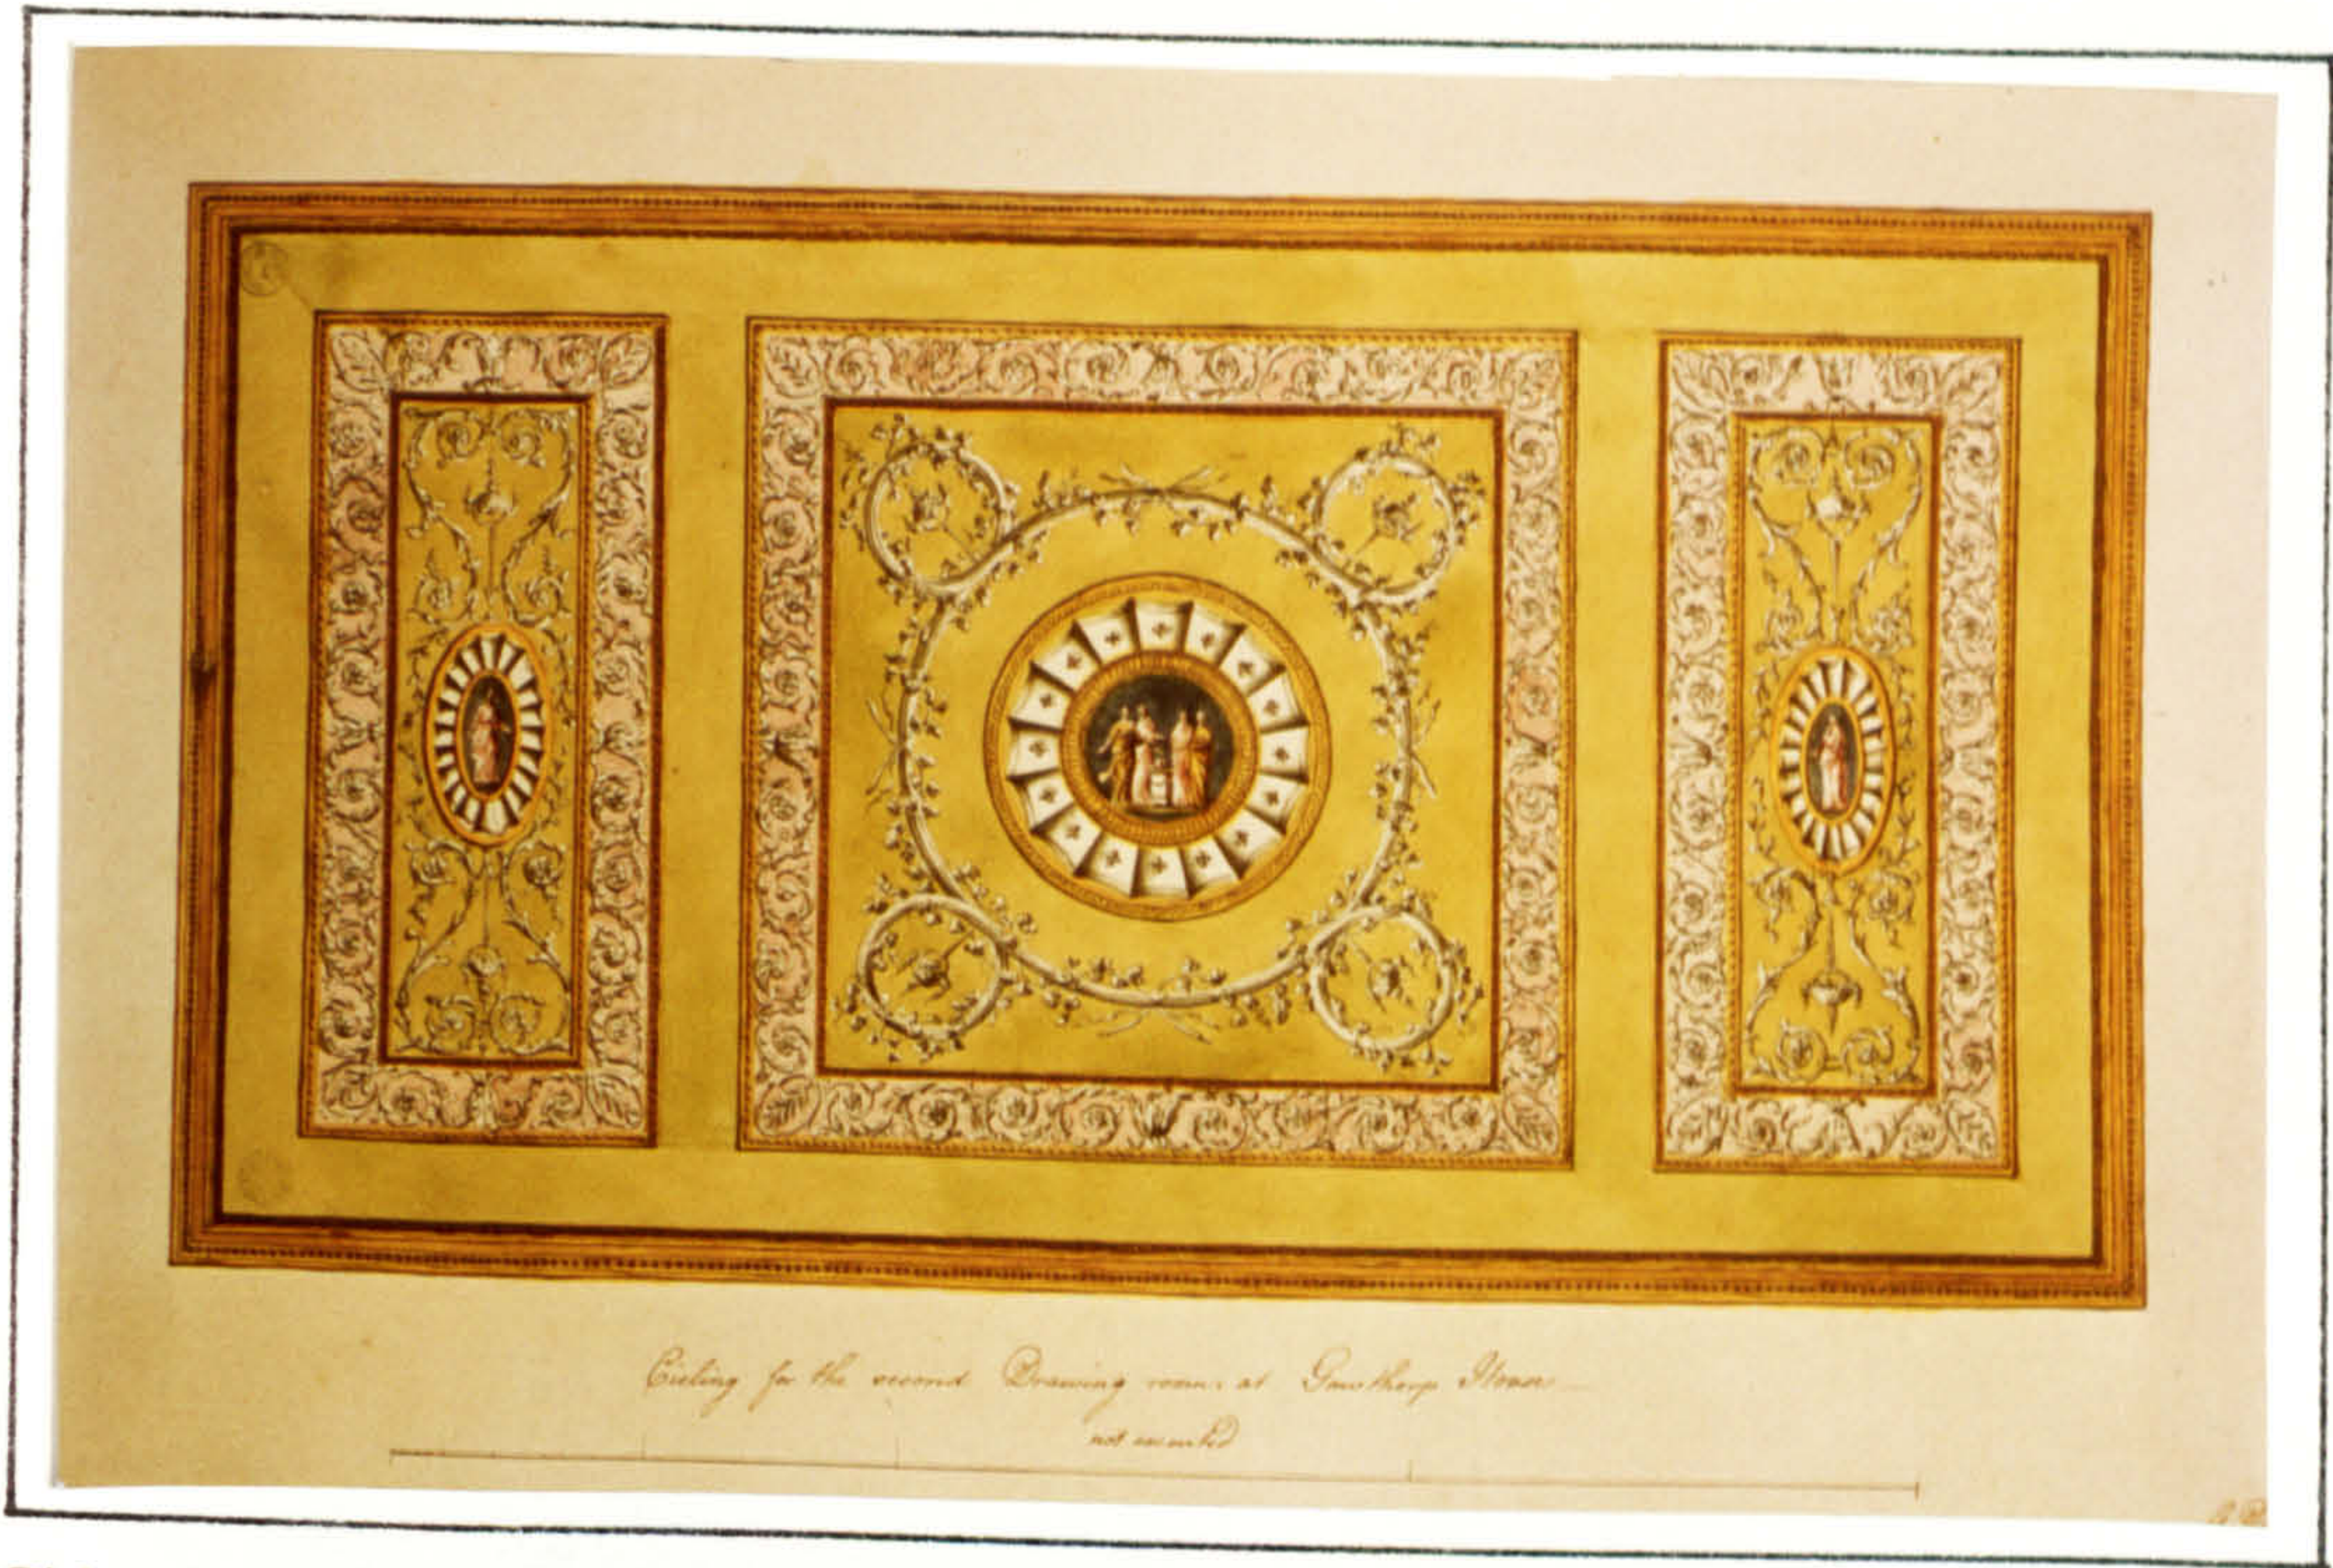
ROBERT ADAM · CEILING DESIGN FOR SECOND DRAWING ROOM
